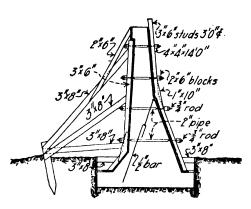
FORMS FOR RETAINING WALL, C. B. & Q. R. R.
